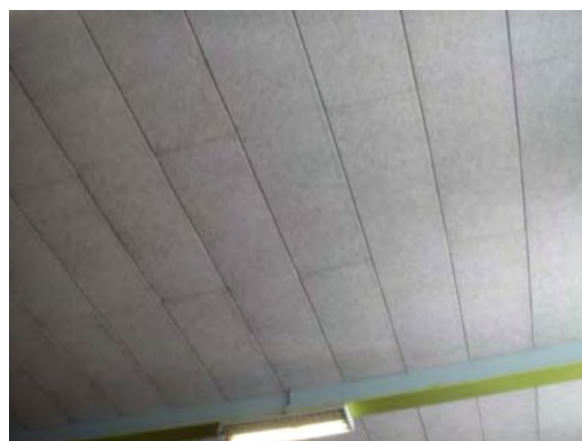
GYM CEILING PANELS AND STEEL SUPPORT
